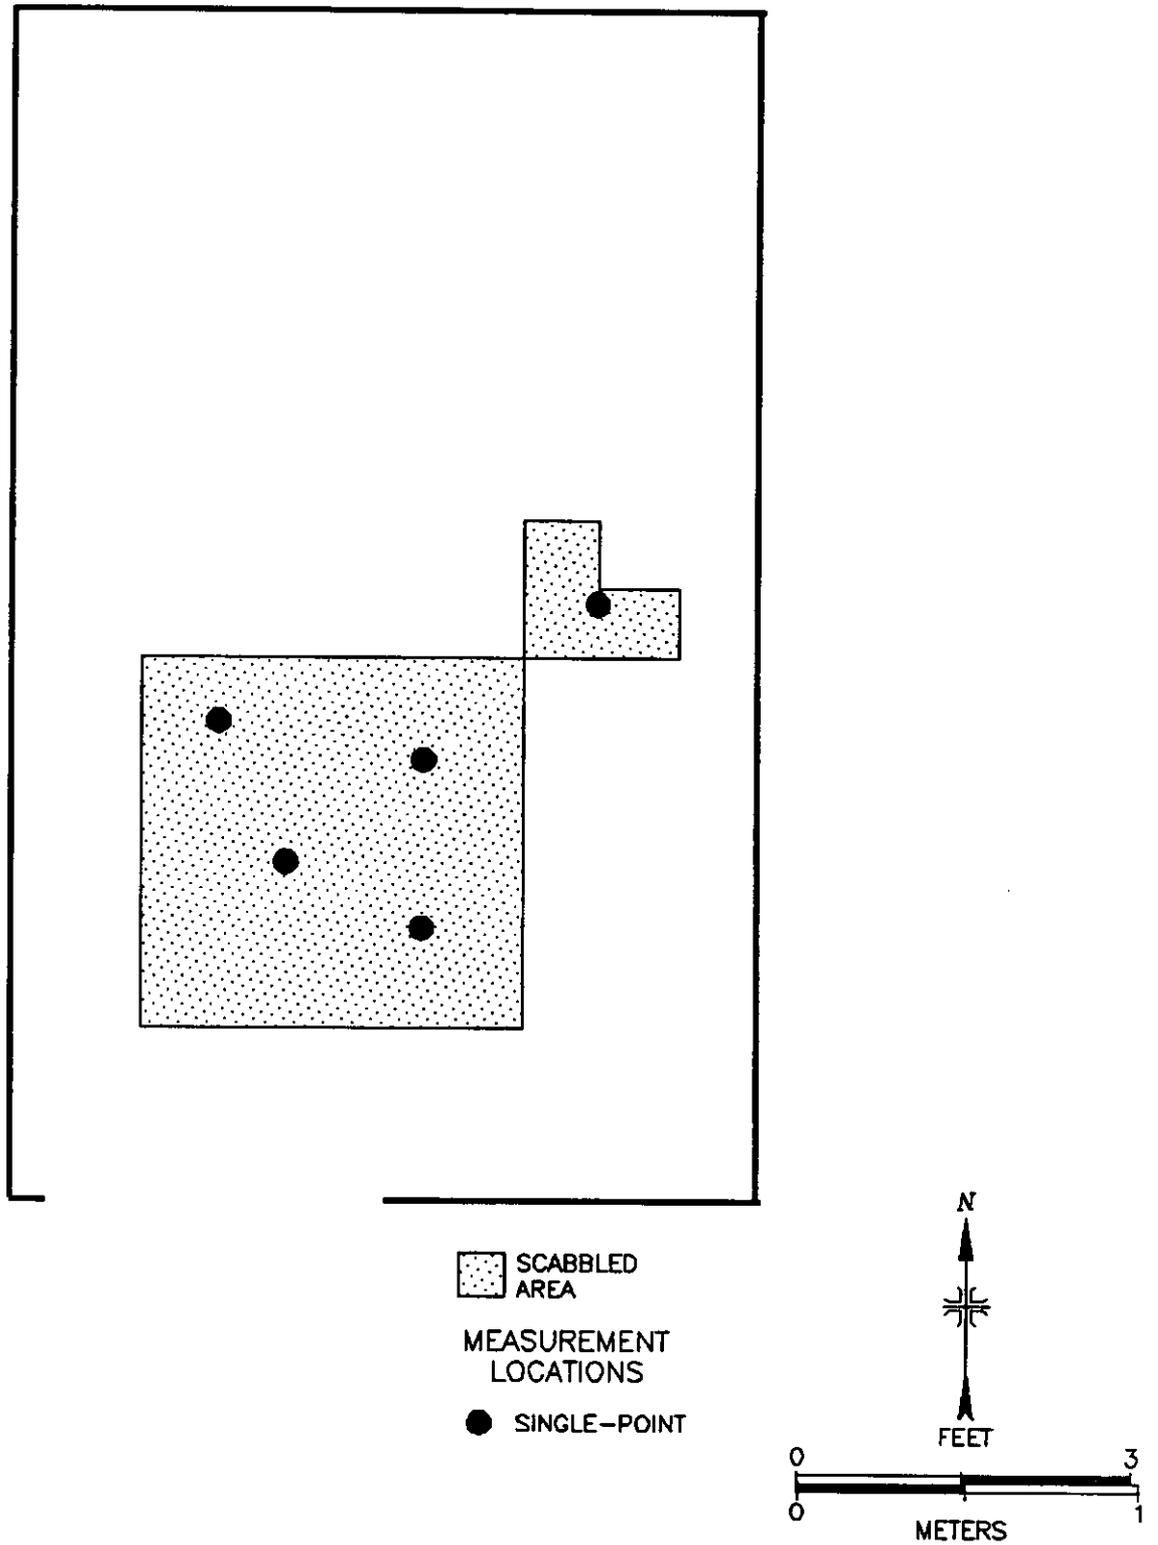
Building 33, Room 103, Indicating Measurement Locations on the Floor
